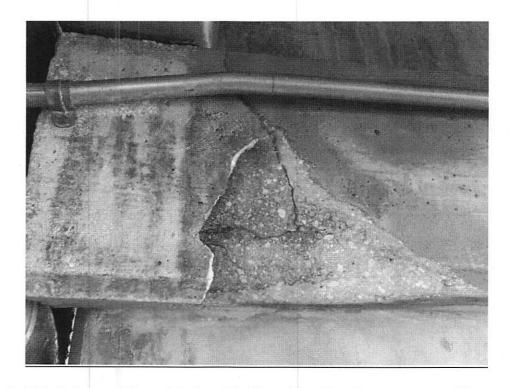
Cracked Haunch below third floor joist. No stirrups found in this area.
